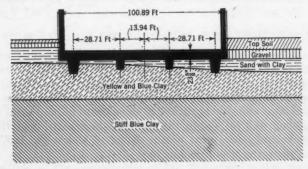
Reinforced Concrete Slab with Ribs, of Building (See Fig. 43)
